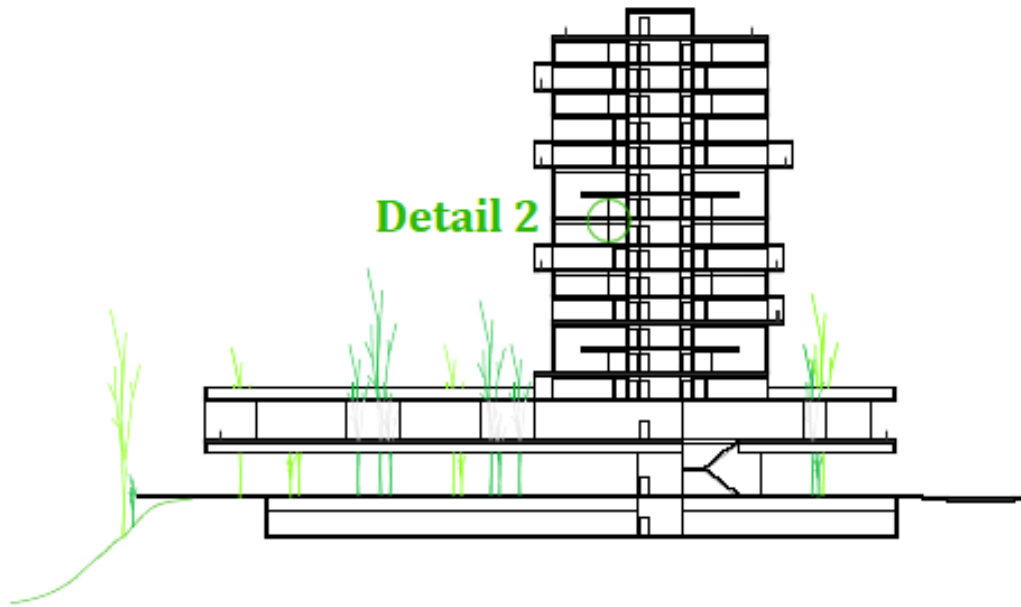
Detail for the floor-ceiling-wall solution for rooms and bathrooms.
